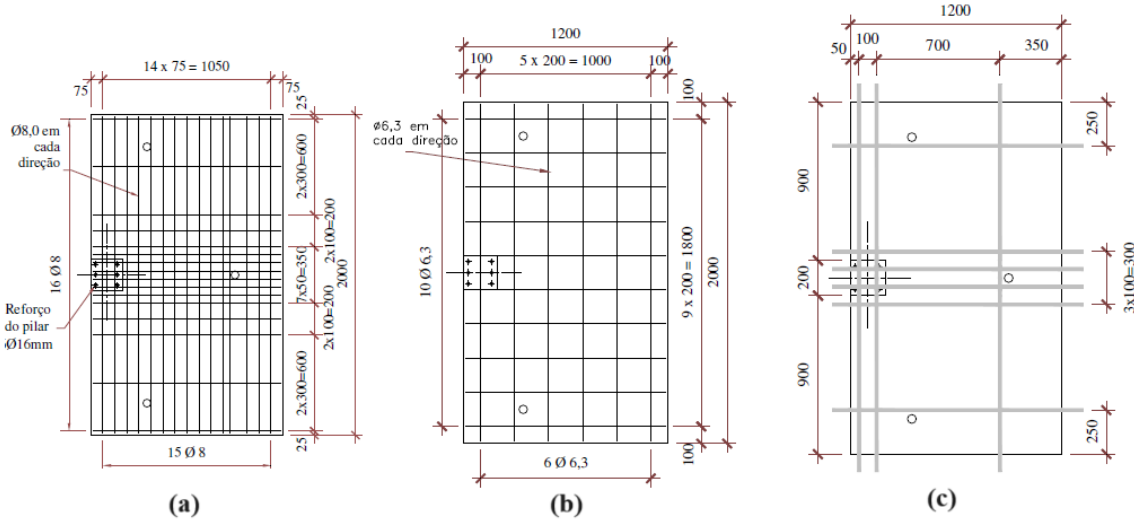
Details of the top and bottom non-prestressed reinforcement and plan arrangement of prestressing tendons (a) Top non-prestressed reinforcement, (b) Bottom non-prestressed reinforcement and (c) Prestressing tendons. Adapted from Barban [1] – Bar diameters and dimension in mm.
